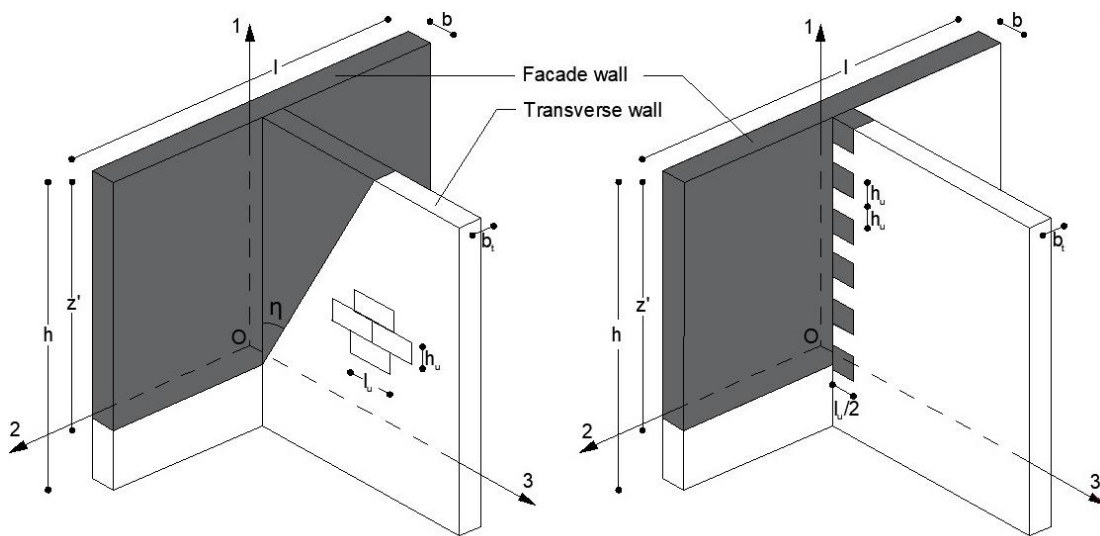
Out-of-plane collapse mechanisms taking into account connections with transversal walls (de Felice and Giannini, 2001).
